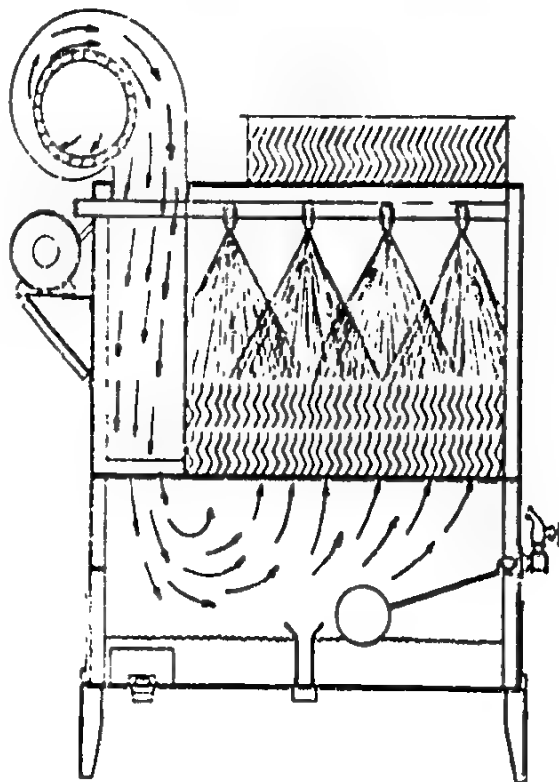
Section through cooling tower of the cabinet type (Recold "Dri-Fan" type, Atlas Ltd., Copenhagen)
